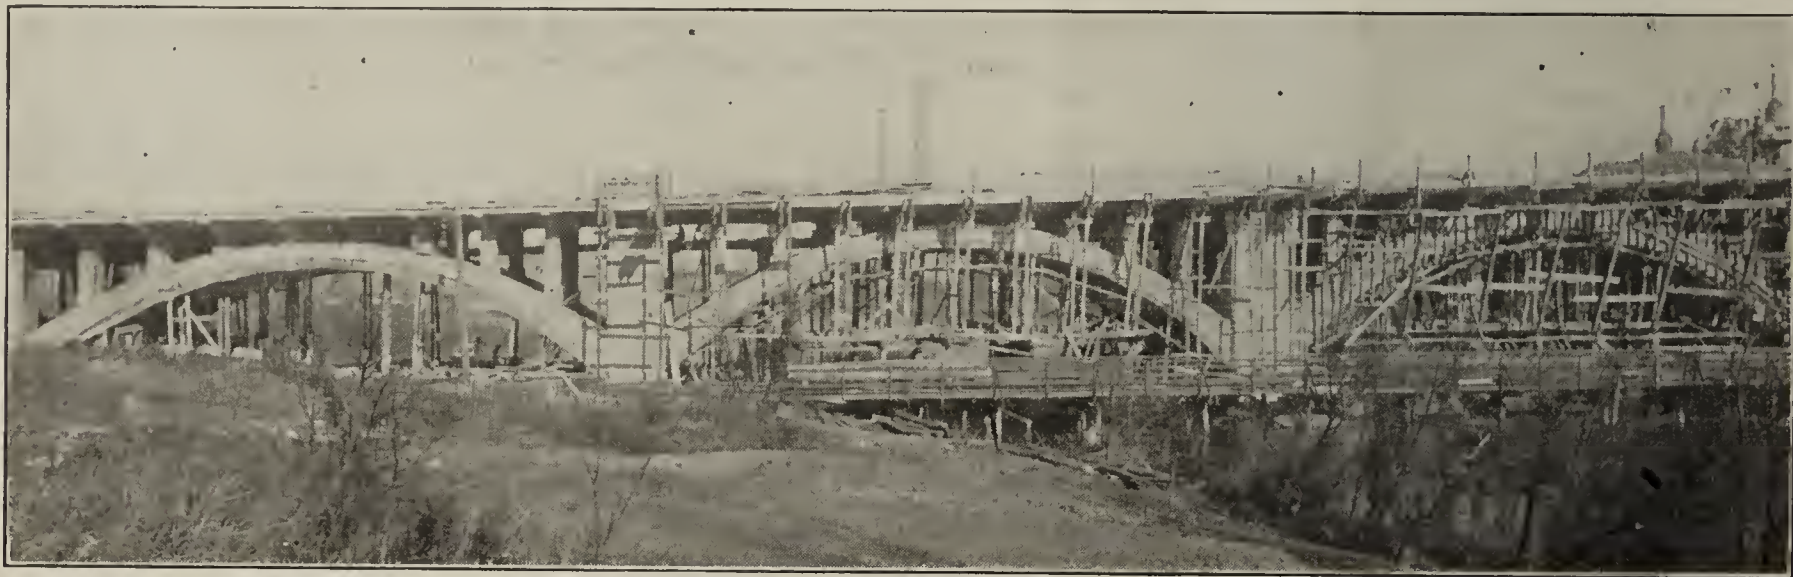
Construction of Morgan Street Reinforced Concrete Bridge, Rockford, Ill.
